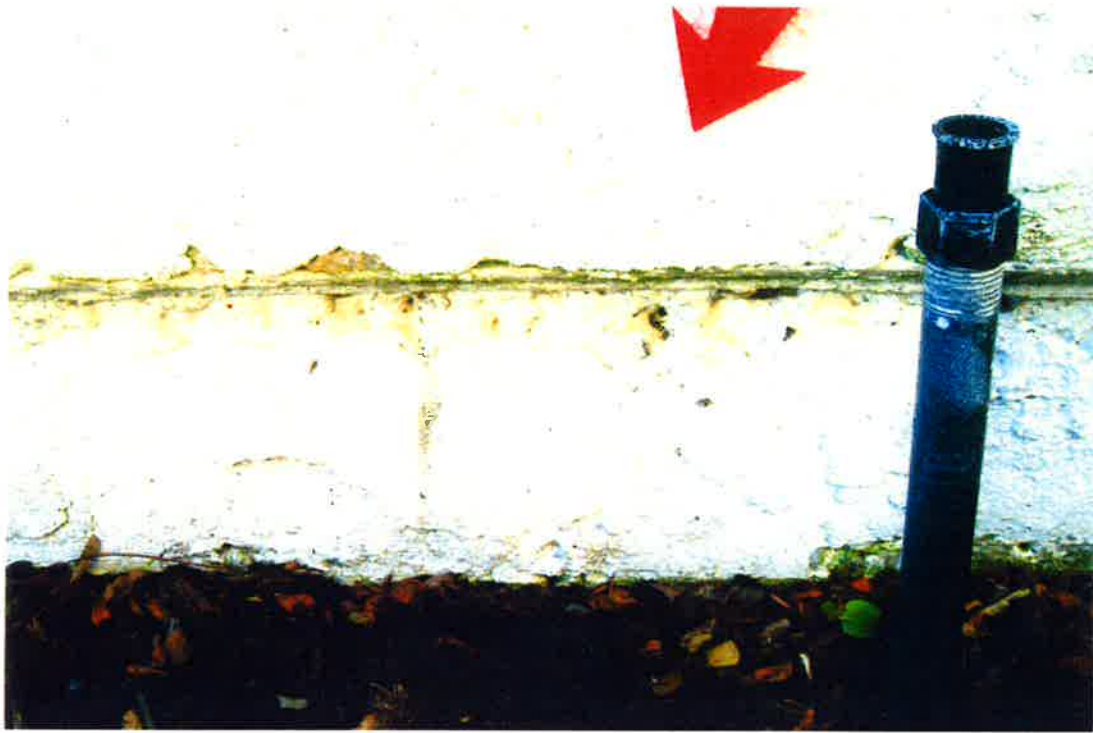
Sprinkler location - stucco failure - weep screed
